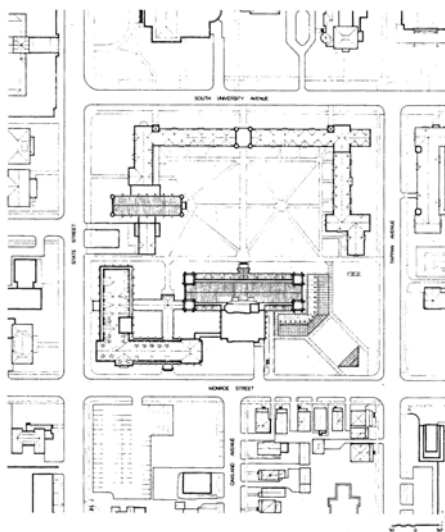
Law library site plan showing the L-shaped underground extension.
